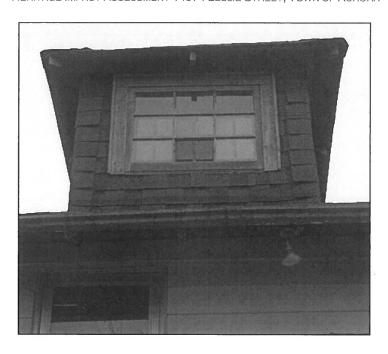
Above: South dormer with multipane sashes, plain trim, and asphalt shingle cladding, 2016. Stylistic exposed rafters are visible in the dormer and dwelling eaves.
